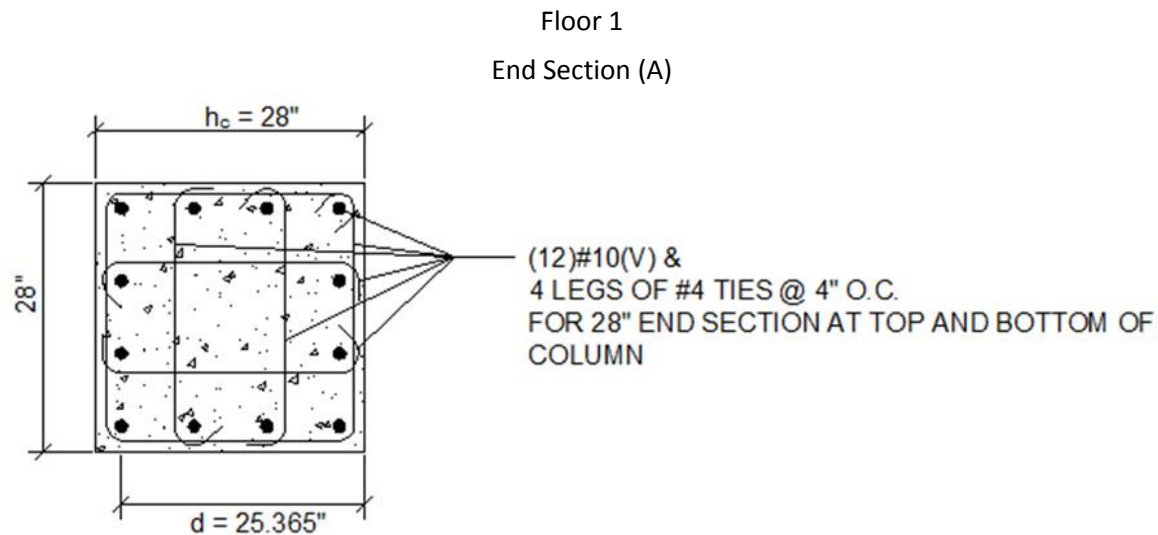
Exterior column, cross-section at end section of column at ground floor level based on tsunami design requirements.
